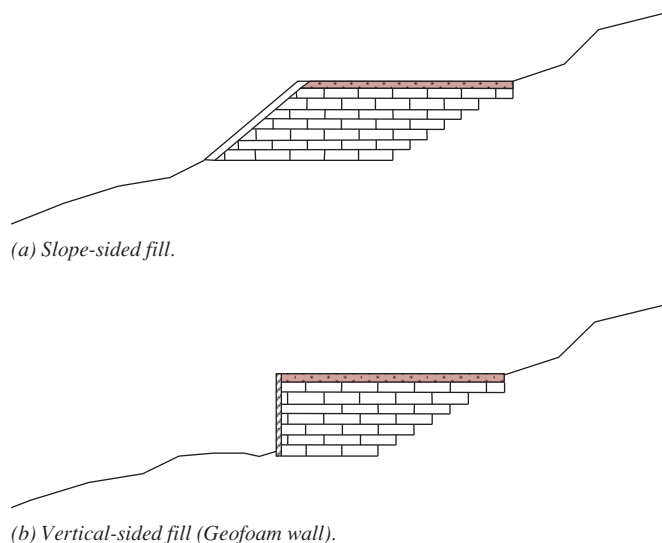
Typical EPS-block geofoam applications involving side-hill fills.
